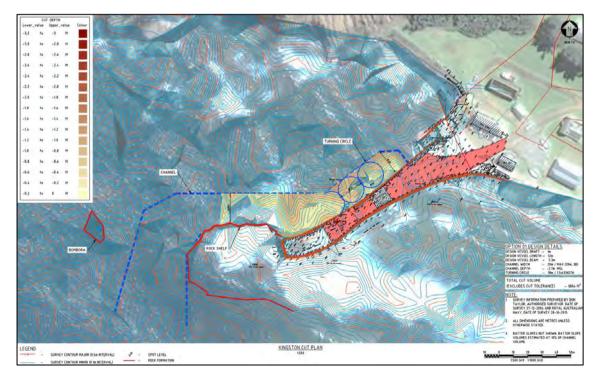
Kingston Pier Channel Cut Plan for Option 1.
